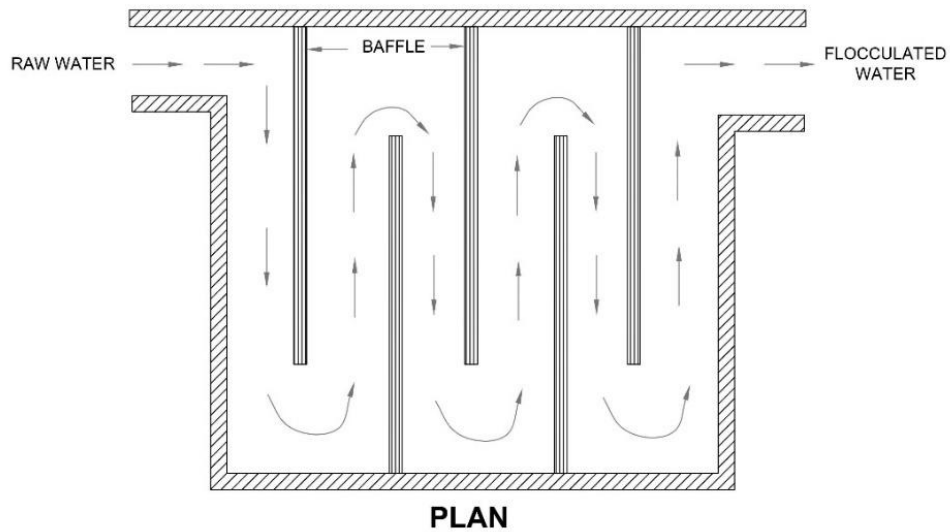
Plan of a Typical Horizontal Flow Baffled Flocculator
